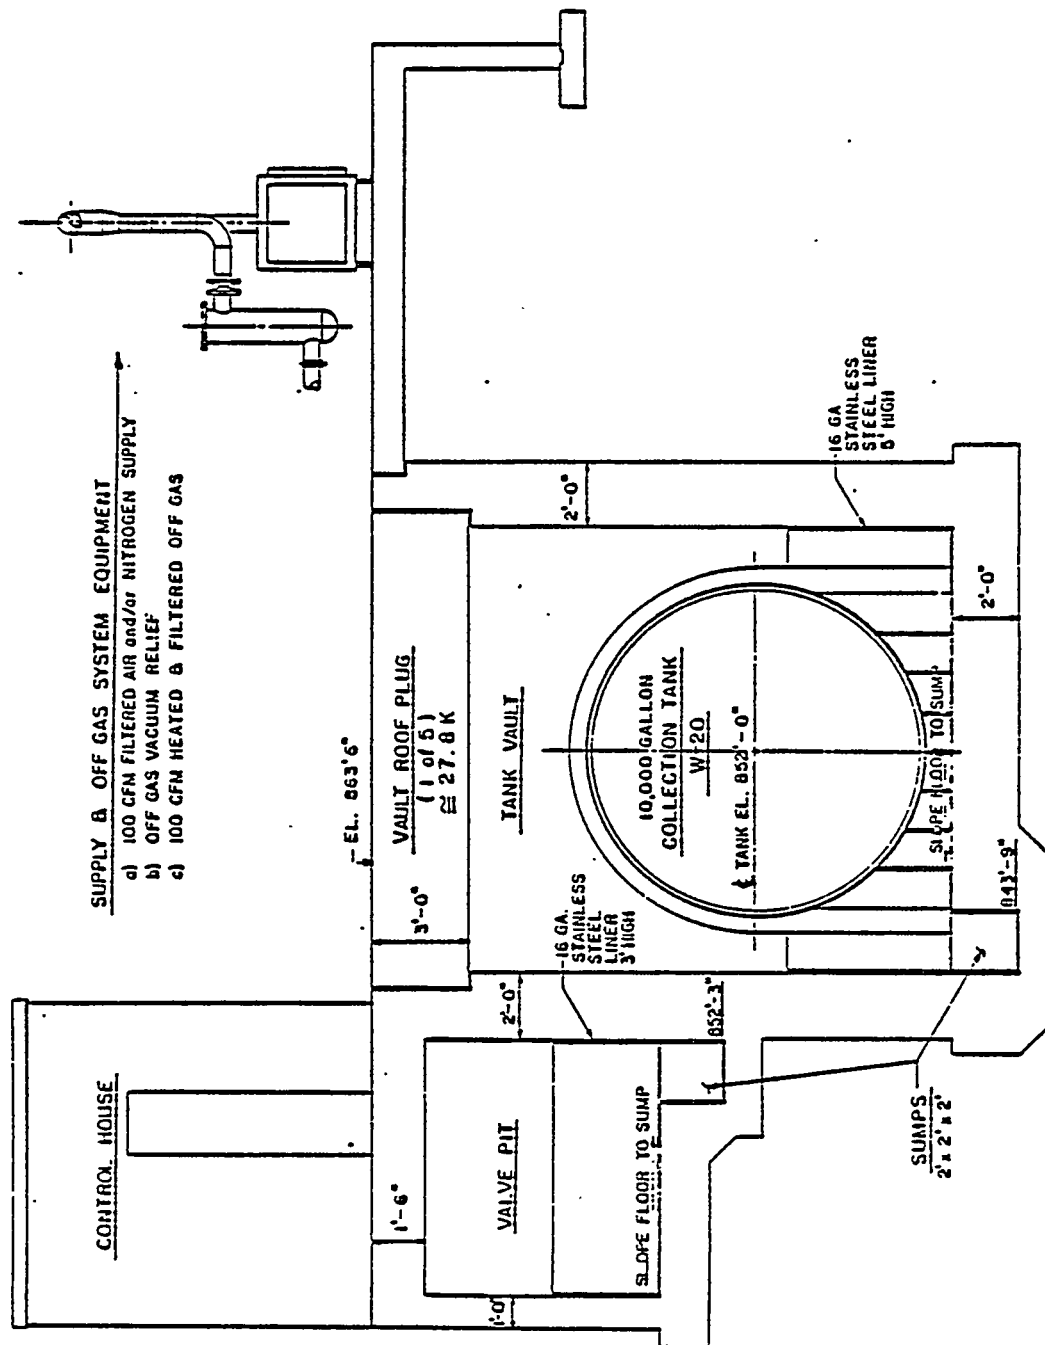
TYPICAL NEW COLLECTION TANK (Binford and Orfi, 1978)
